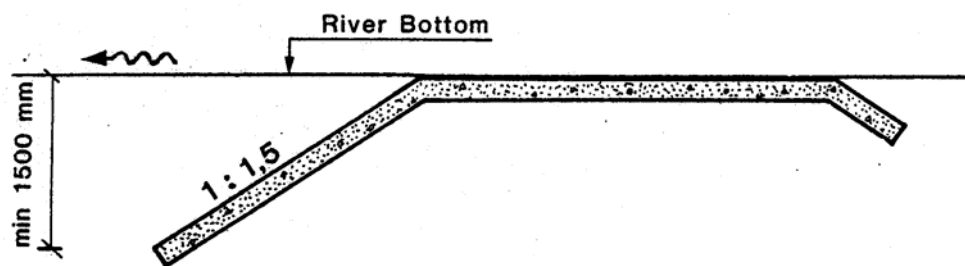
Section through a typical drift on the Marich Pass – Lodwar road
